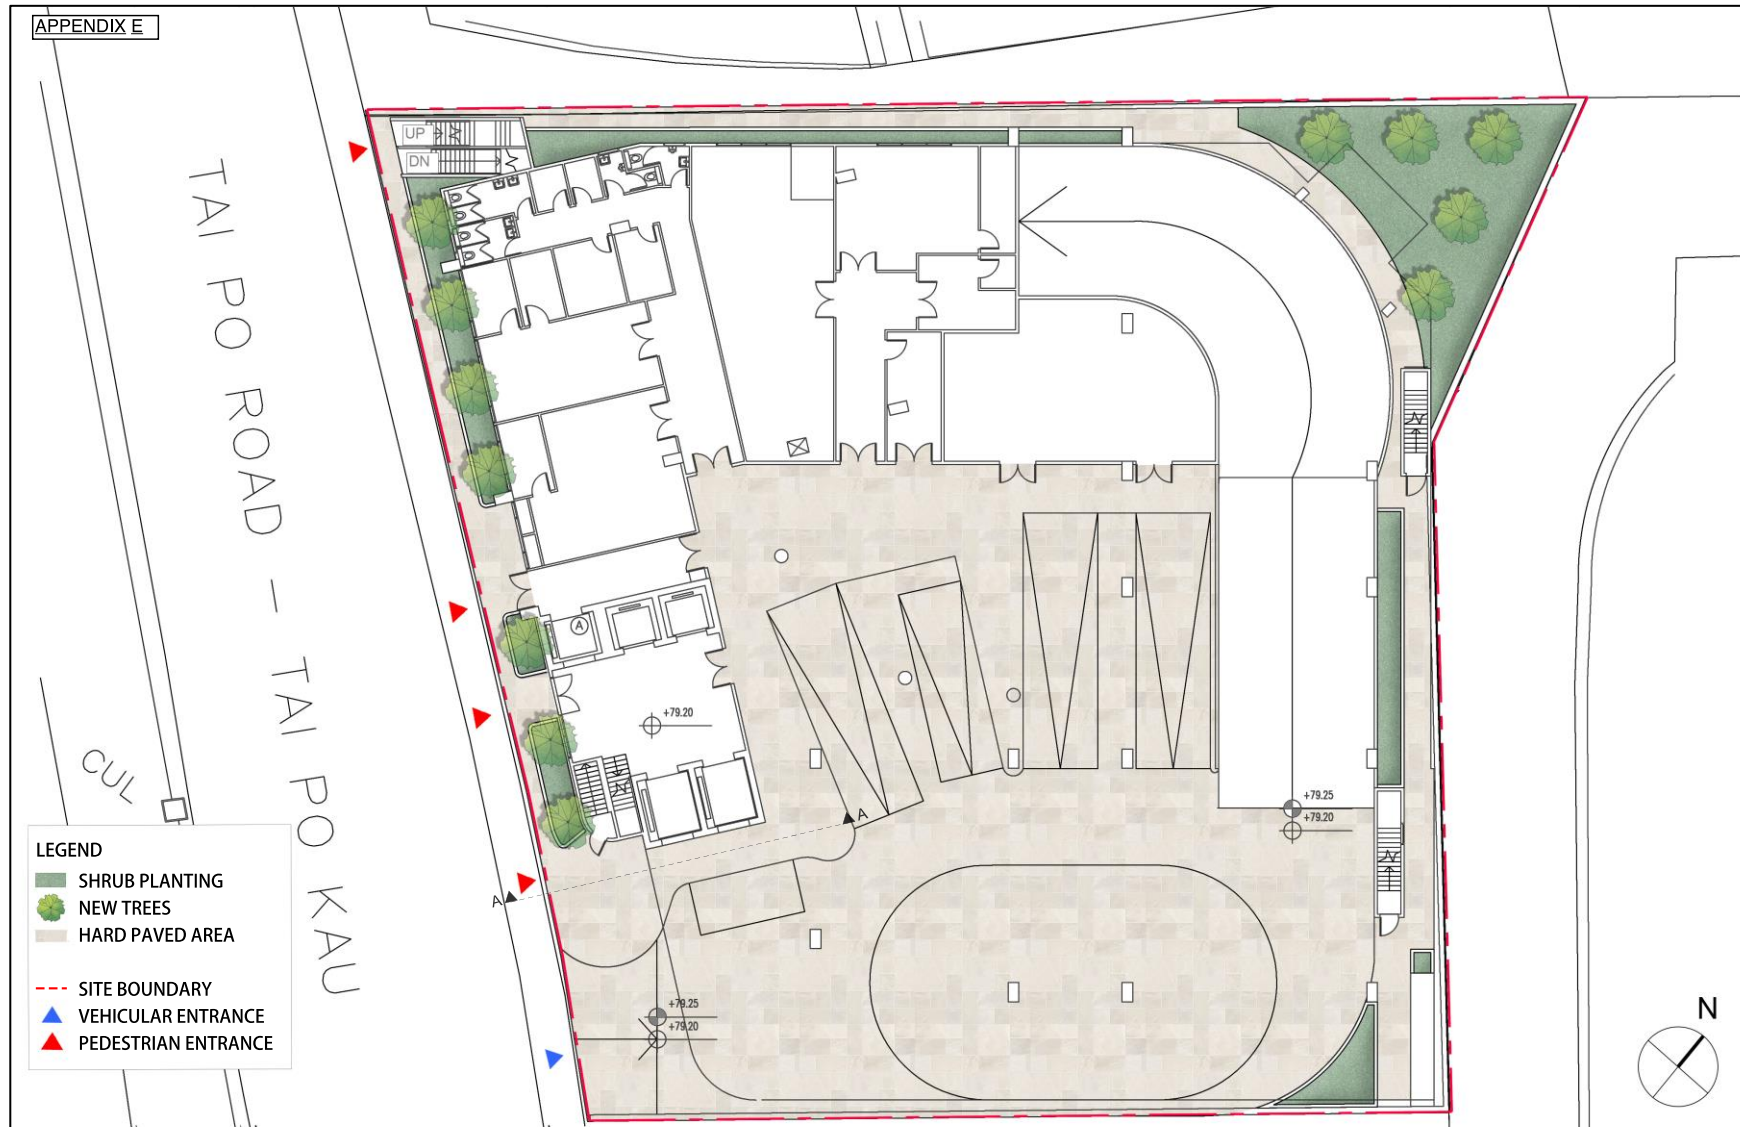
G/F Landscape layout plan of the proposed SC Complex
